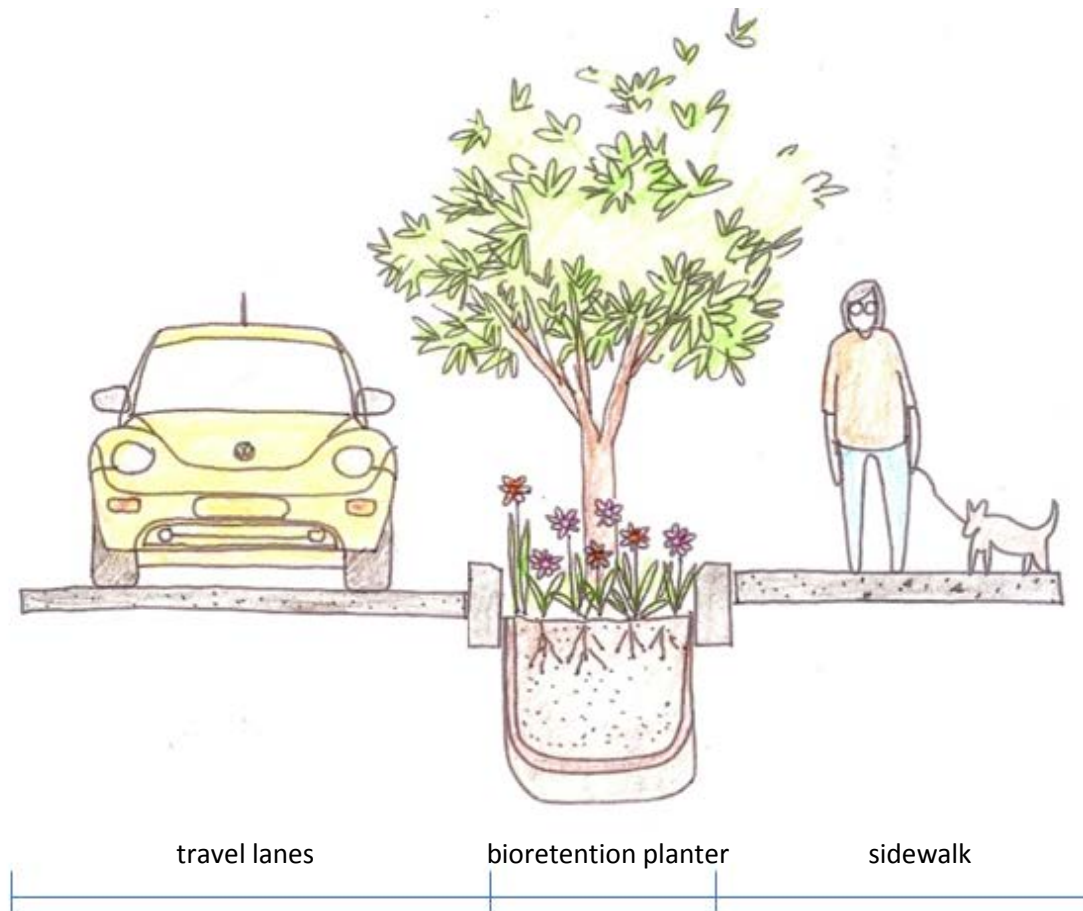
Cross-section illustrating the street bioretention planter at the sidewalk
